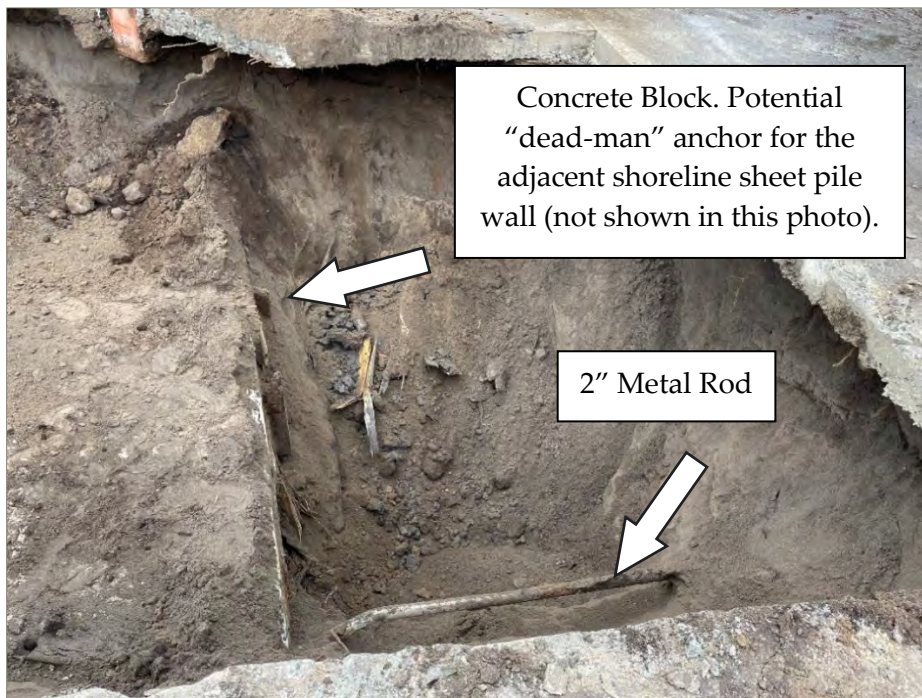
Area 8 – View of the West Half Final Extent of the Excavation. Photo taken on October 5, 2021. View direction is south. A metal rod and concrete block were observed in the excavation and are potential structural components of the adjacent sheet pile wall.
